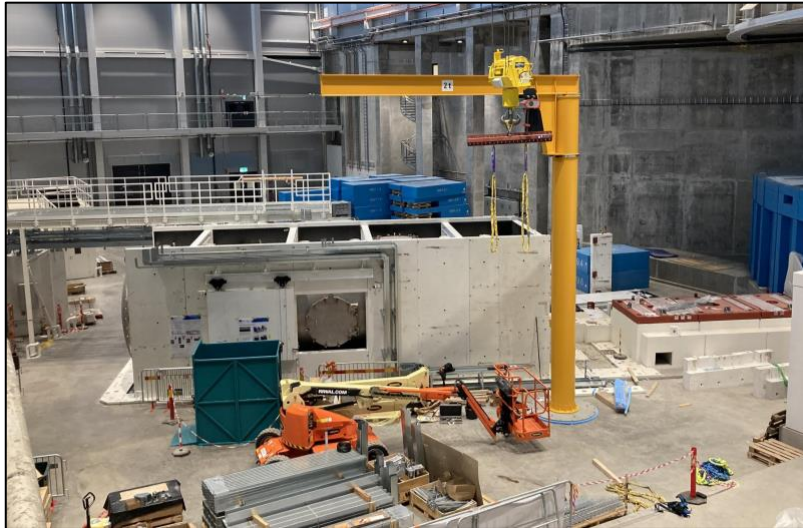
Picture of the LoKI as of March 2023. Recent progress: remaining instrument cave structure, the good lifts, local crane, and cable routing infrastructure.
